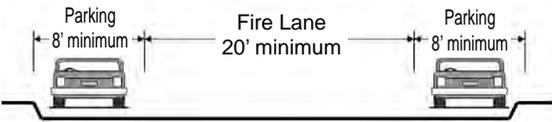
Figure X. A typical Emergency Access standard with 36' (11 m) curb to curb width (source: Ontario Fire Department, California)
